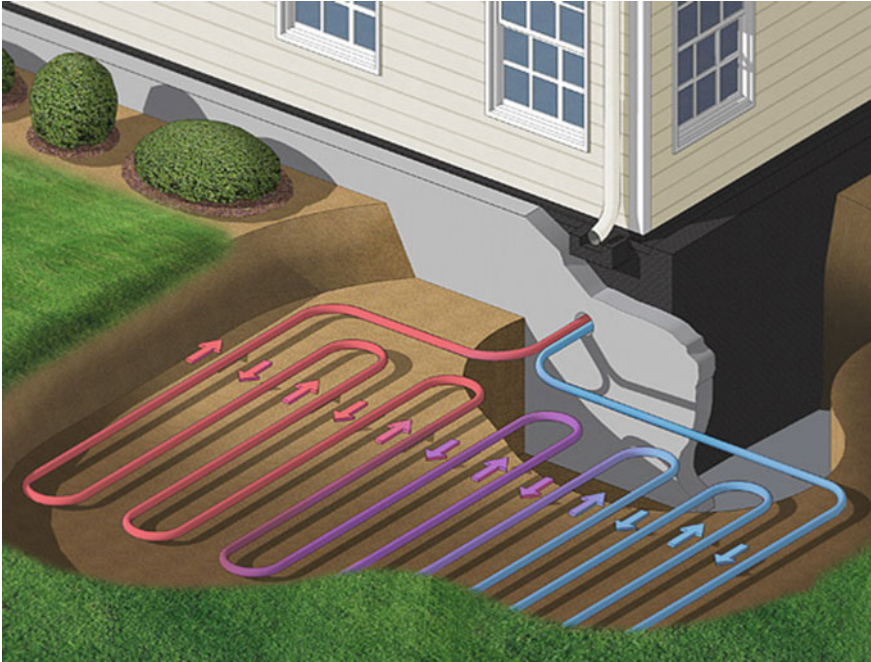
The underground loop layout in geothermal heat pump systems (SWRE.com)
